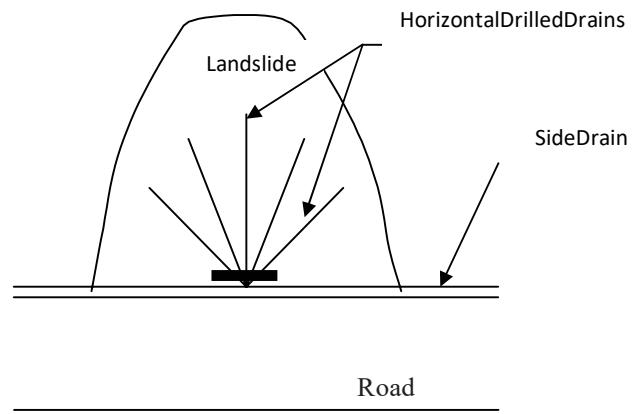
Typical Plan and Section of Horizontal Drilled Drain
